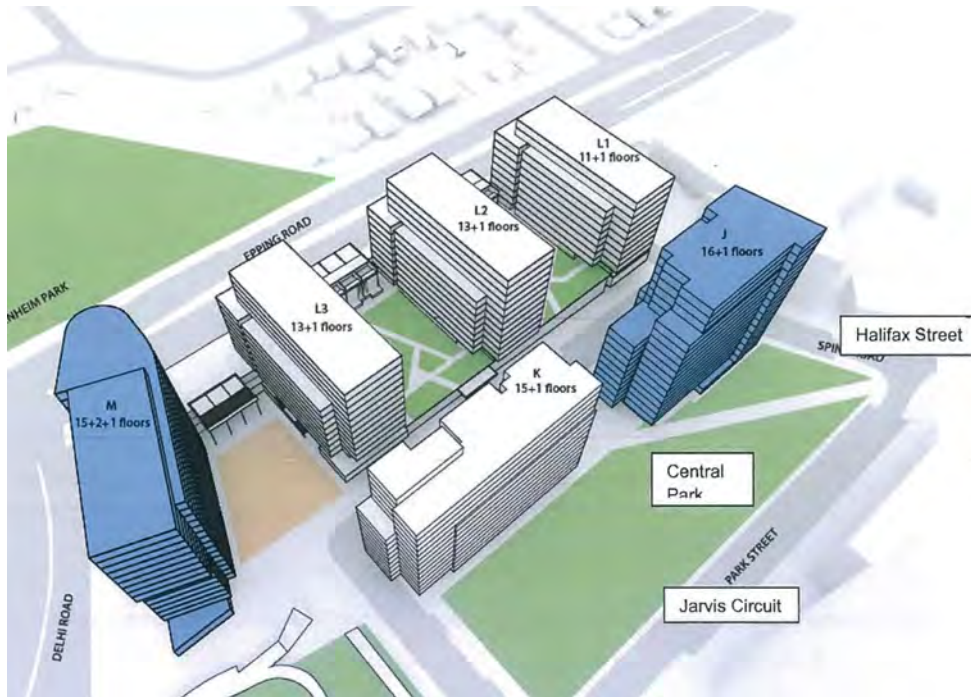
Block diagram of proposed buildings across Lot 104 and Lot 105
